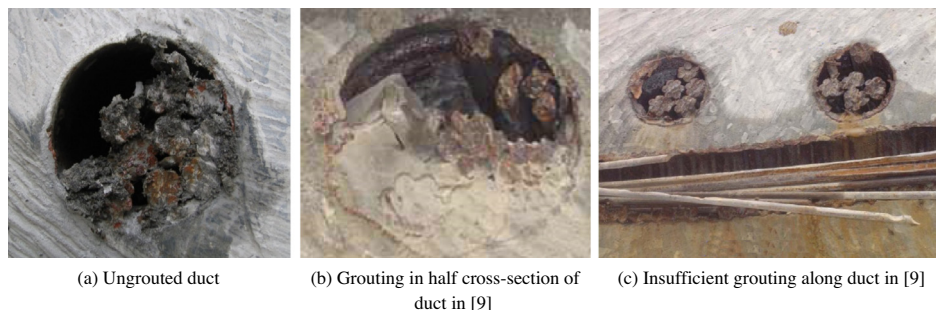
Strand corrosion and insufficient grouting in existing PC bridges.
